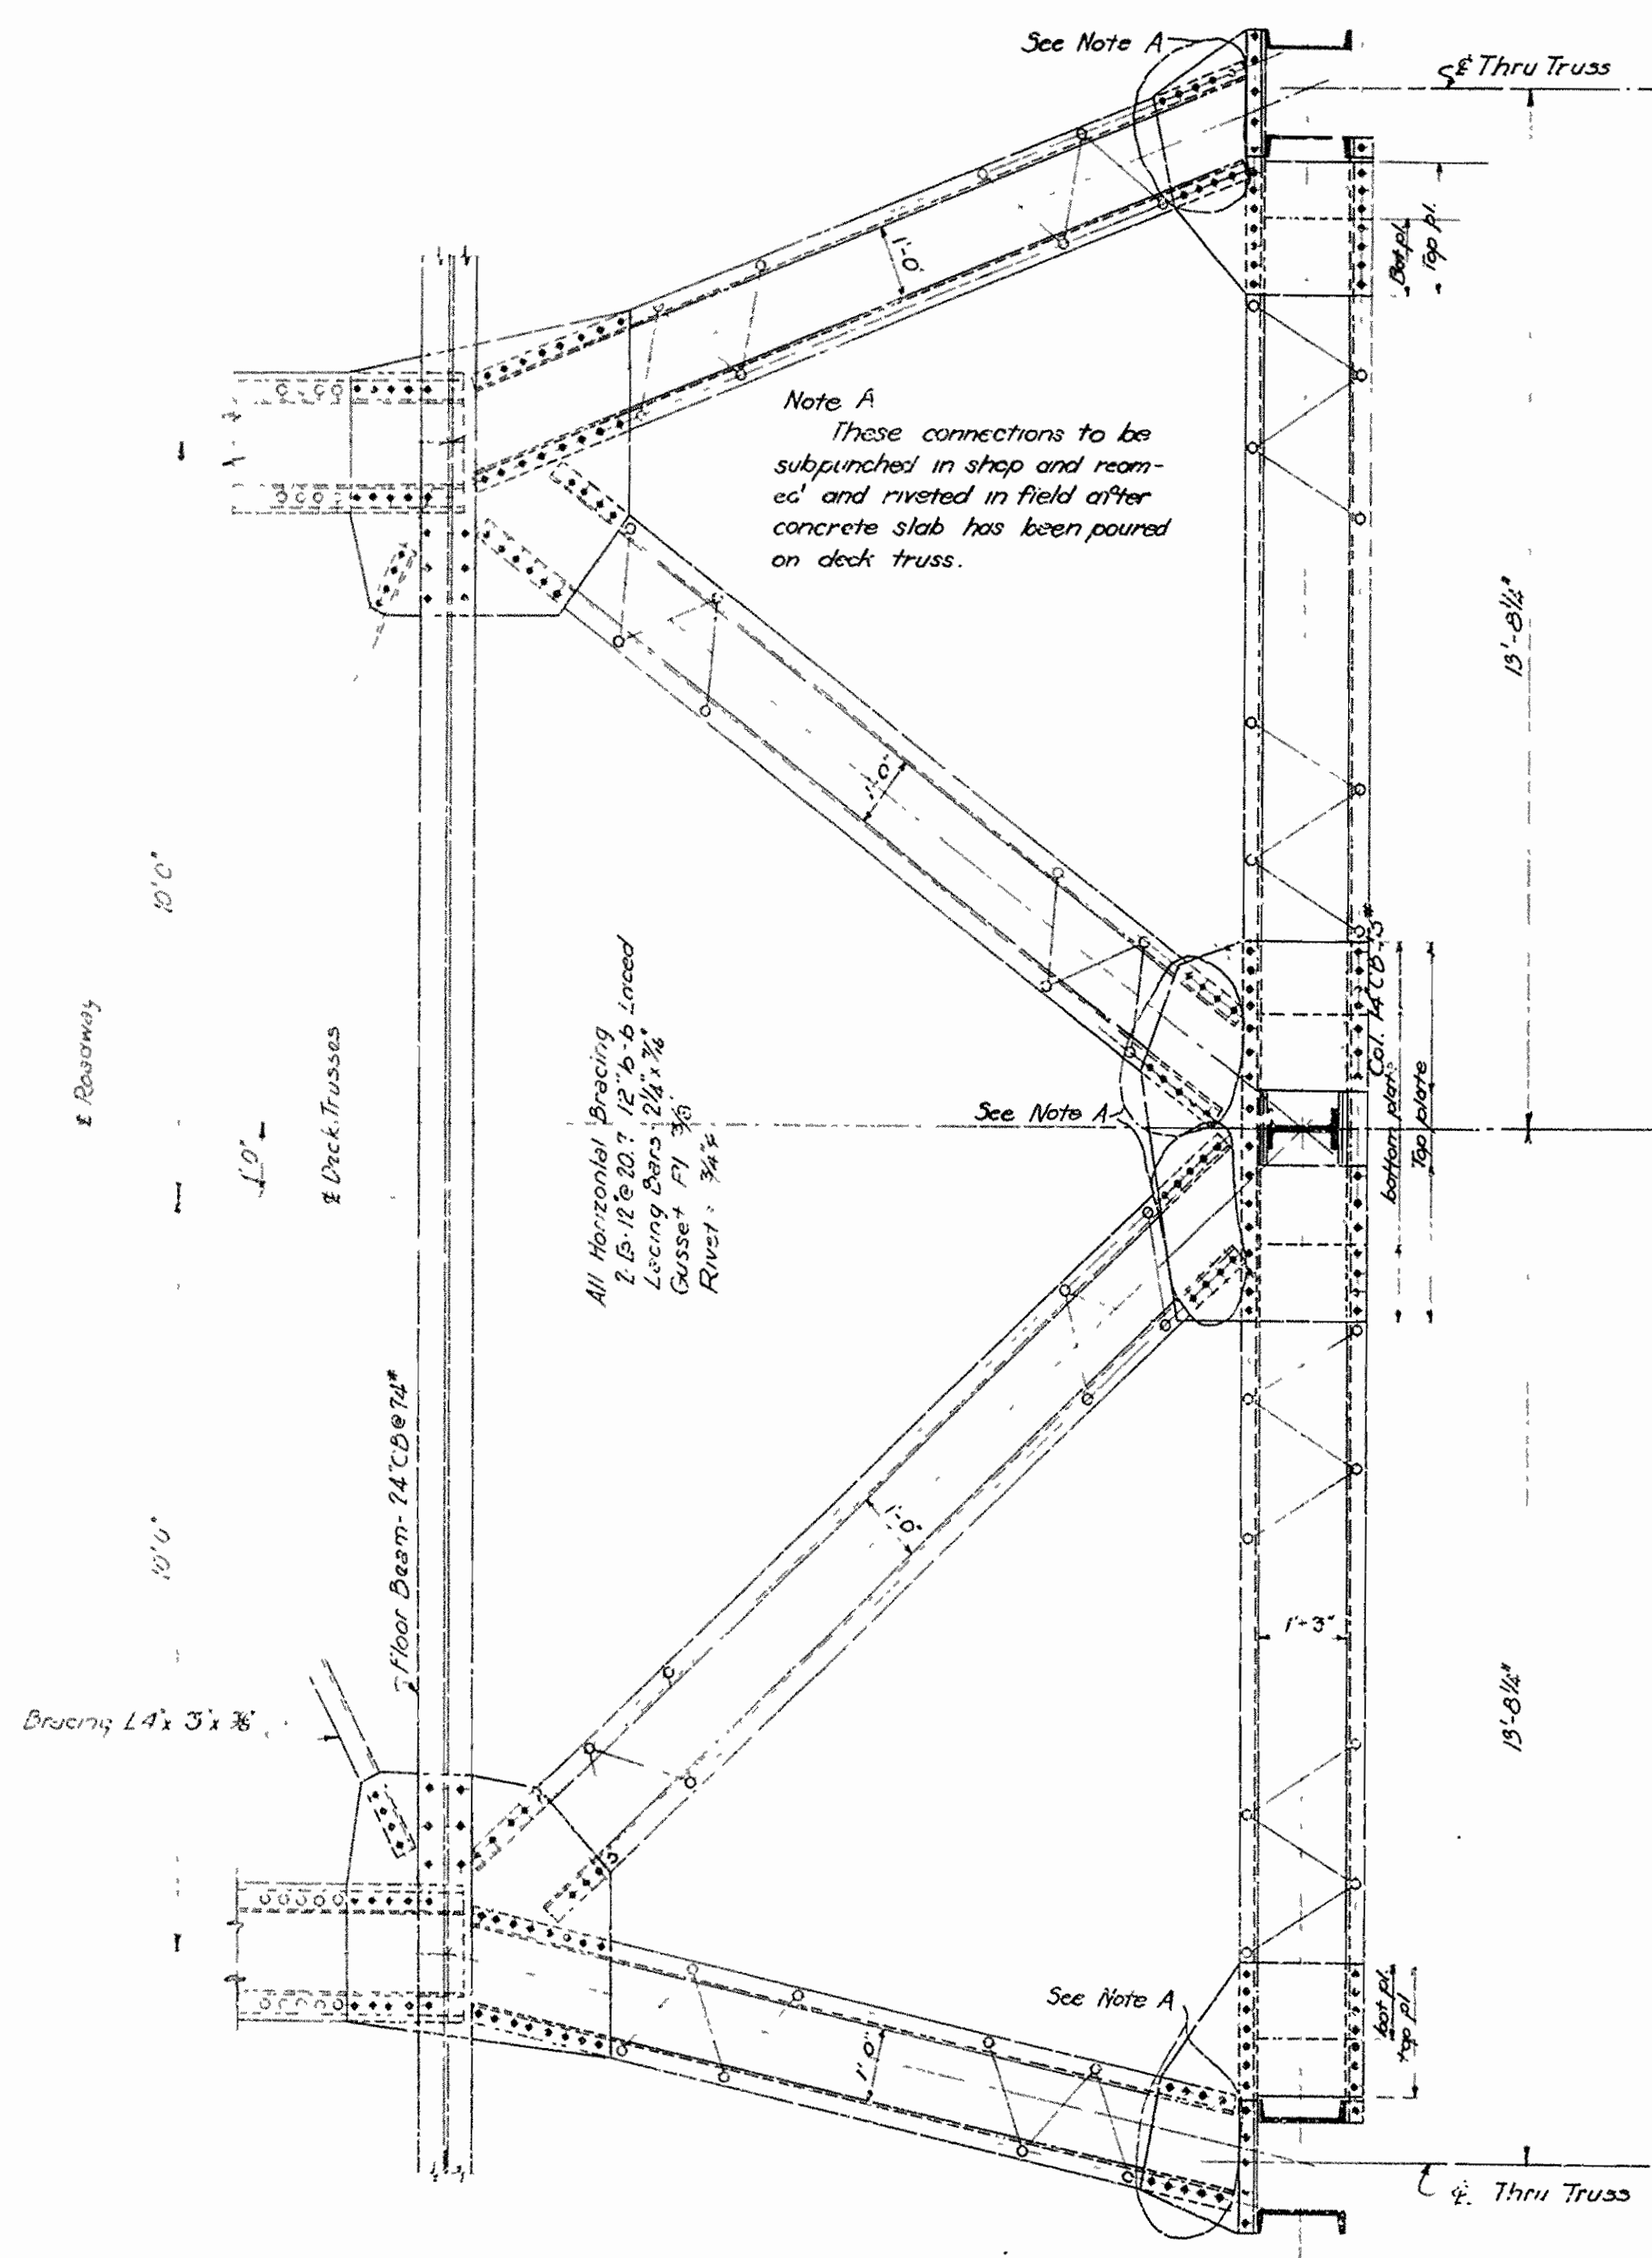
DETAIL OF SIDEWALK TRUSS SPANS 7, 8, & 9 OVERPASS OVER S.T.L. - S.F. RWY. IMBODEN, ARK. LAWRENCE & RANDOLPH COUNTIES ROUTE 62 SEC. 18-A & 18 ARKANSAS STATE HIGHWAY COMMISSION LITTLE ROCK, ARK.
